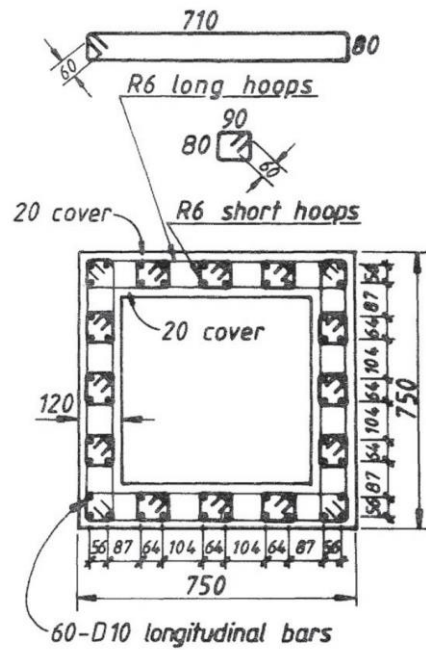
Hollow-Core Concrete Column with Two-Layers of Reinforcement and Cross Ties (Mander et al., 1983) (Dimensions in mm)
